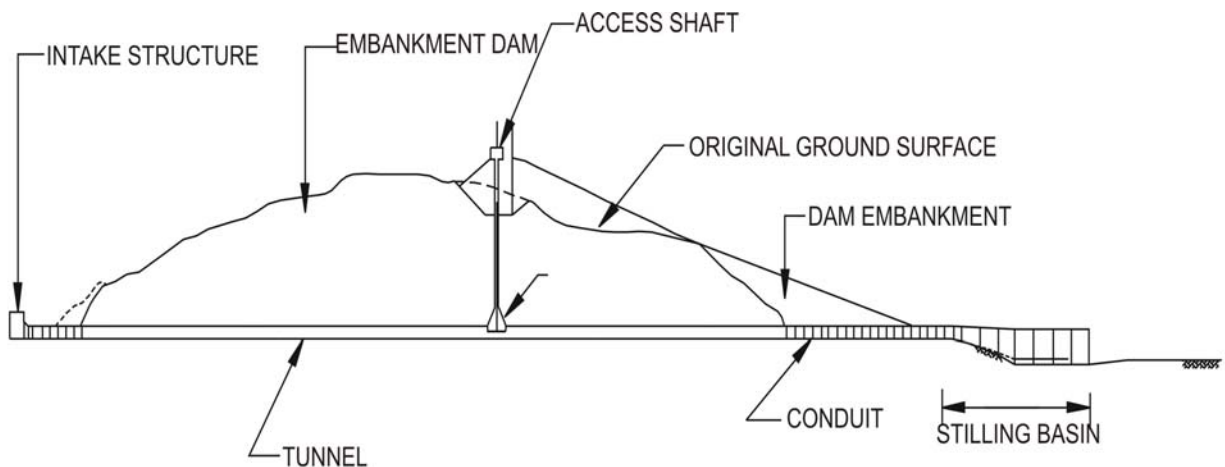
OUTLET WITH TRASHRACK INTAKE STRUCTURE,PRESSURE TUNNEL UPSTREAM OF GATE CHAMBER,FREE TUNNEL AND CONDUIT ON DOWNSTREAM
